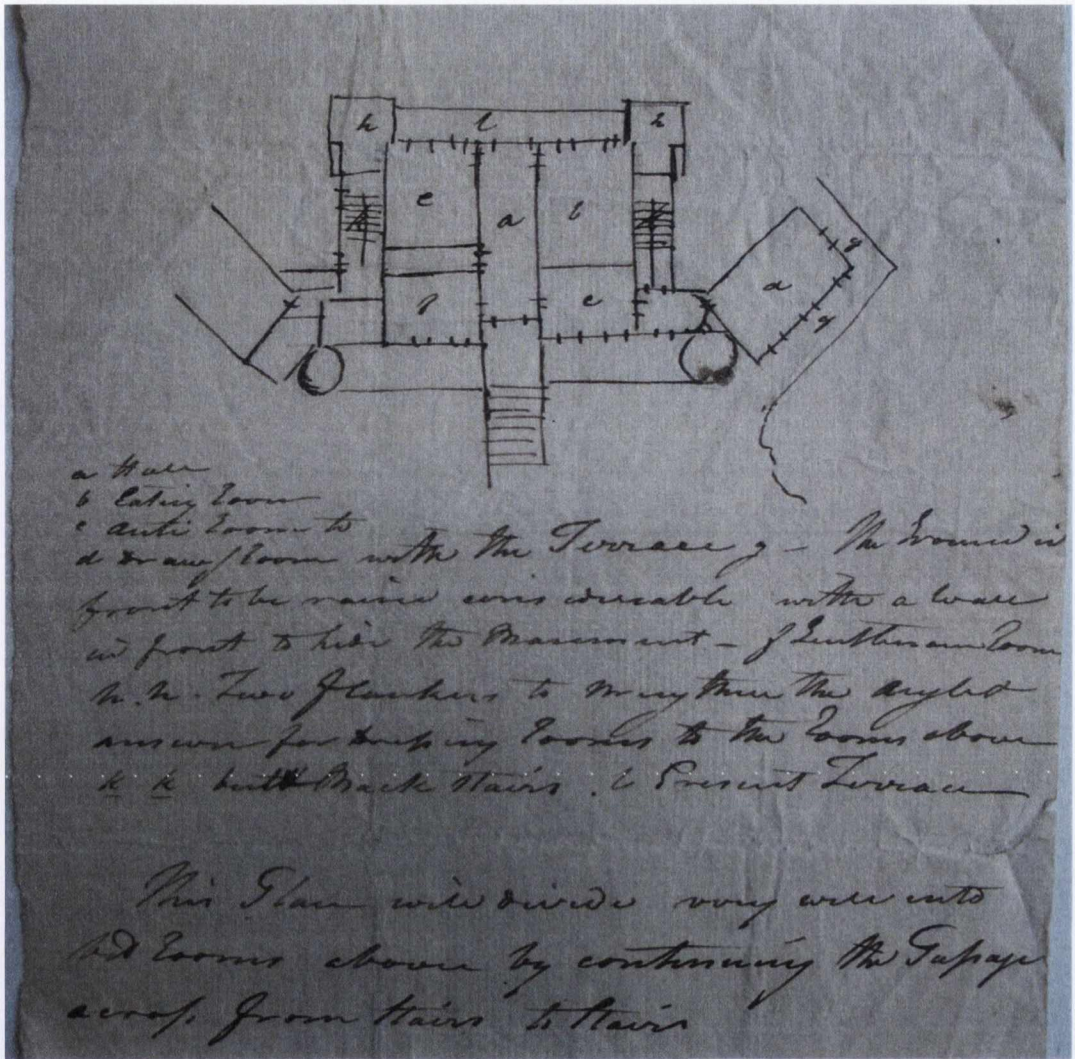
Birr Castle, proposed ground floor plan, attrib. to John Johnston, [1801], Rosse papers, O/17/3.
